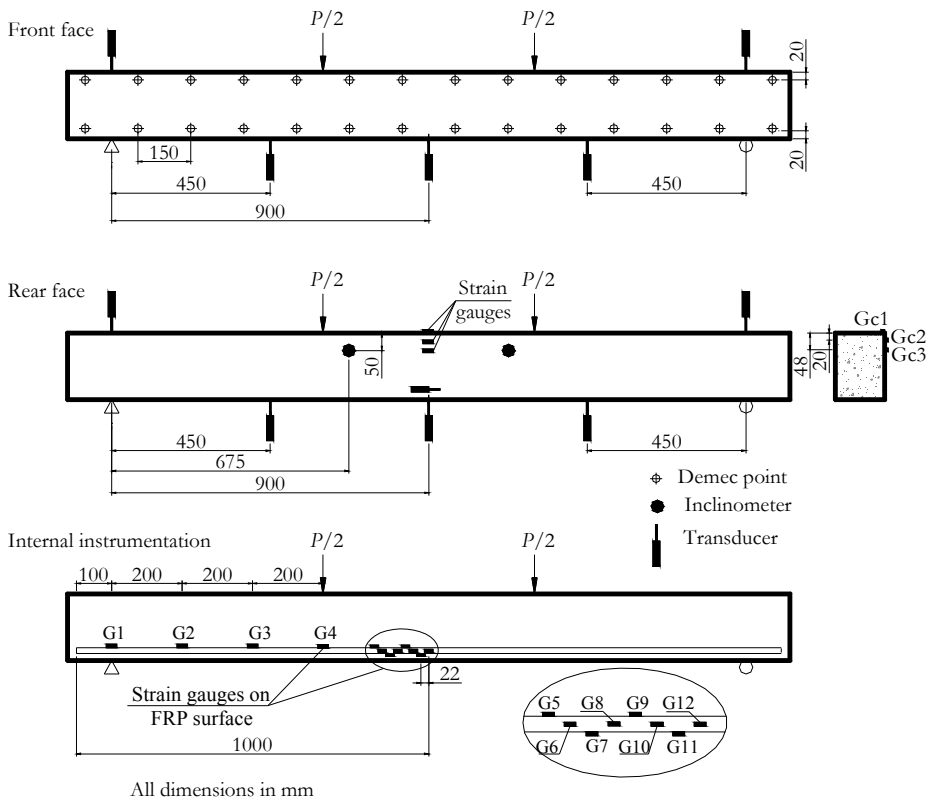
Instrumentation details for beam C1-216-D2-B.
